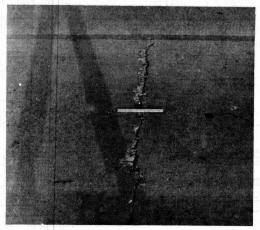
Spalling at transverse crack (Tarrant County Project).
